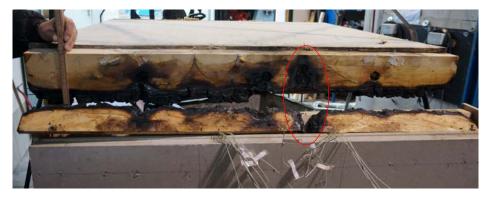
Small-scale fire test – wall-floor – 90 min – almost burn-through between OSB and coupling beam (red circle)
